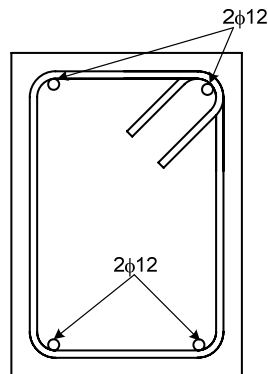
Provisions of TEC-2007 for Column Reinforcement Layout
